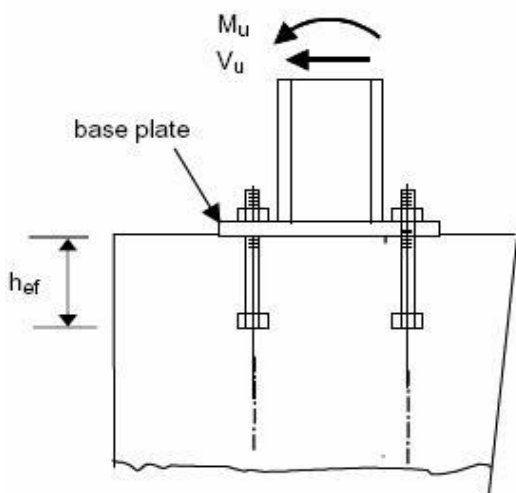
Typical forces and arrangement of anchor bolt system (Ahmad, 2009)
